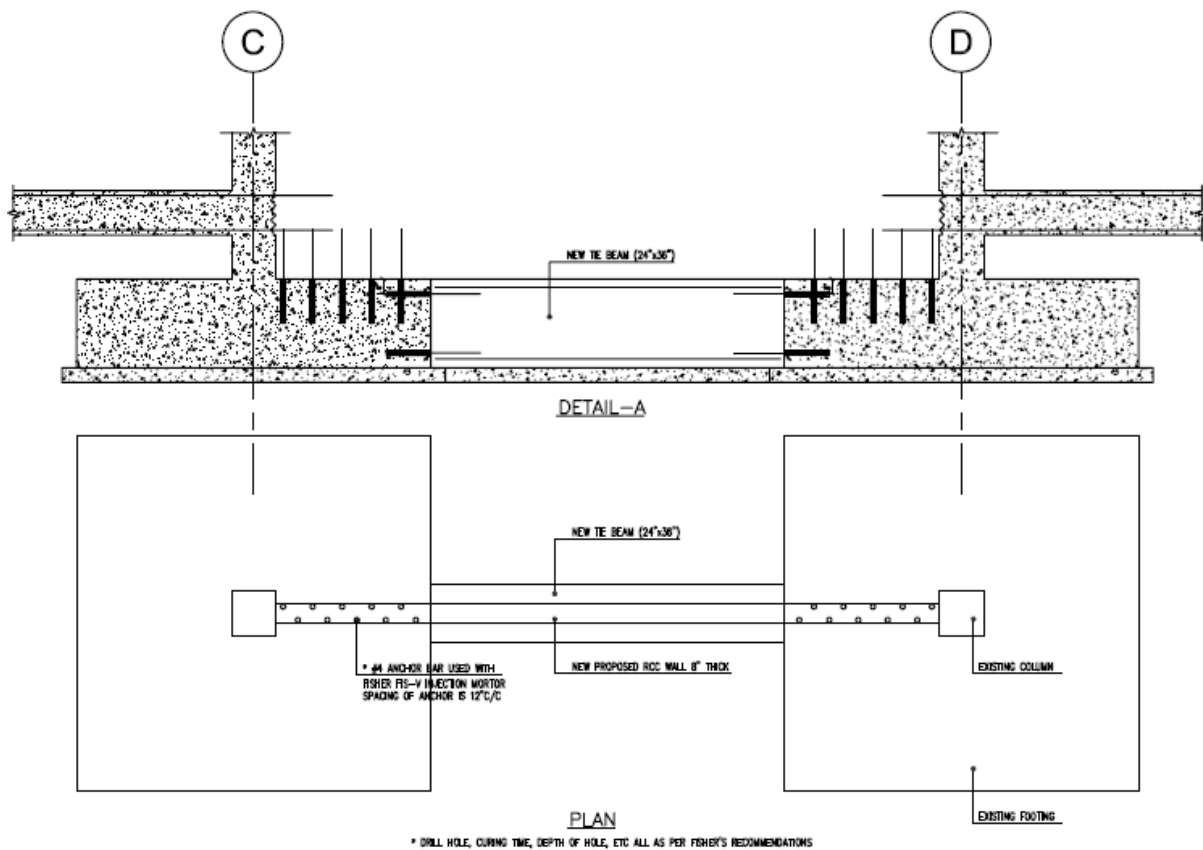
Elevation detail showing removal of existing grade beam and new tie beam below spine
